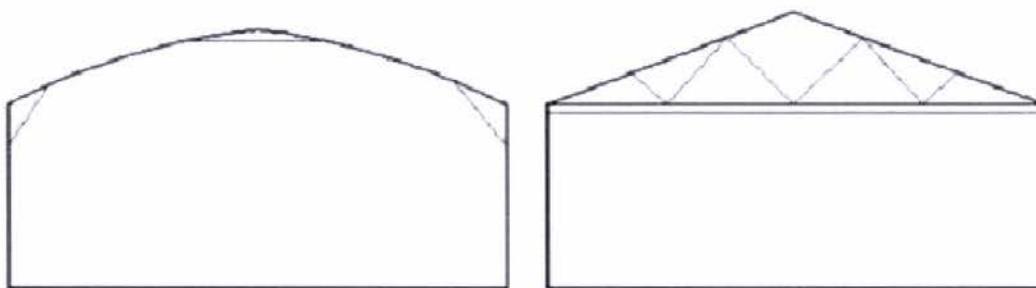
Cosecant curved roof (left) and standard gable roof (right) with alternative truss design of a greenhouse construction.
